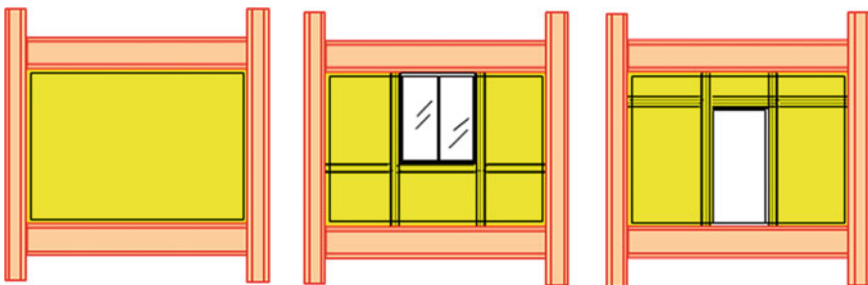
Openings in steel shear walls and boundary elements around the openings
